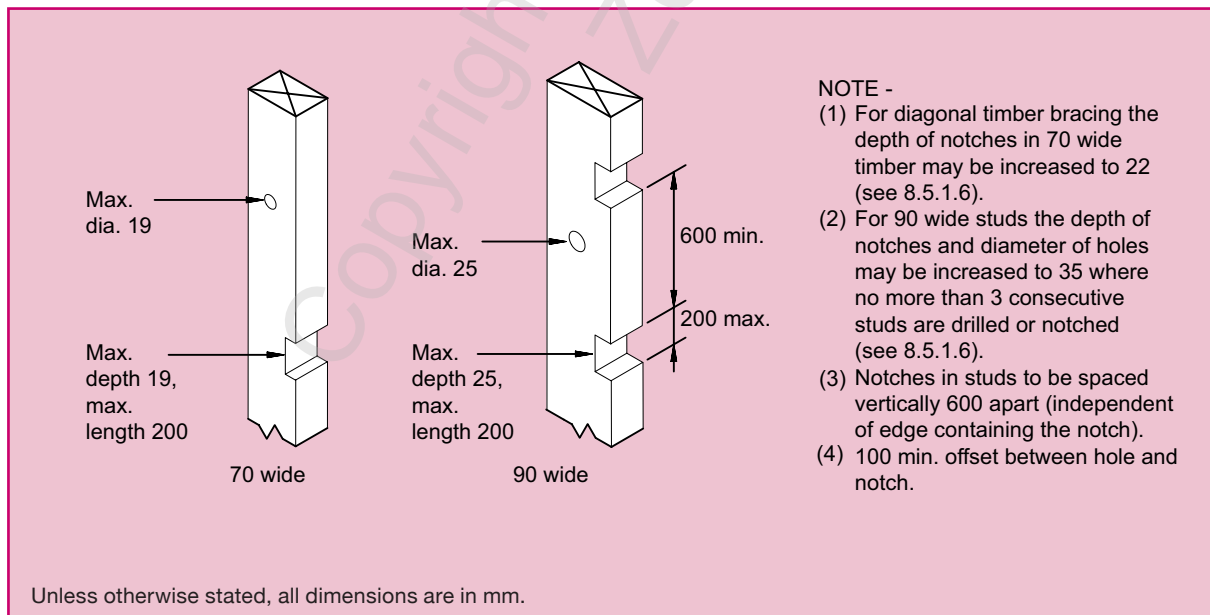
Checking and boring studs ([see 8.5.1.6](#))
